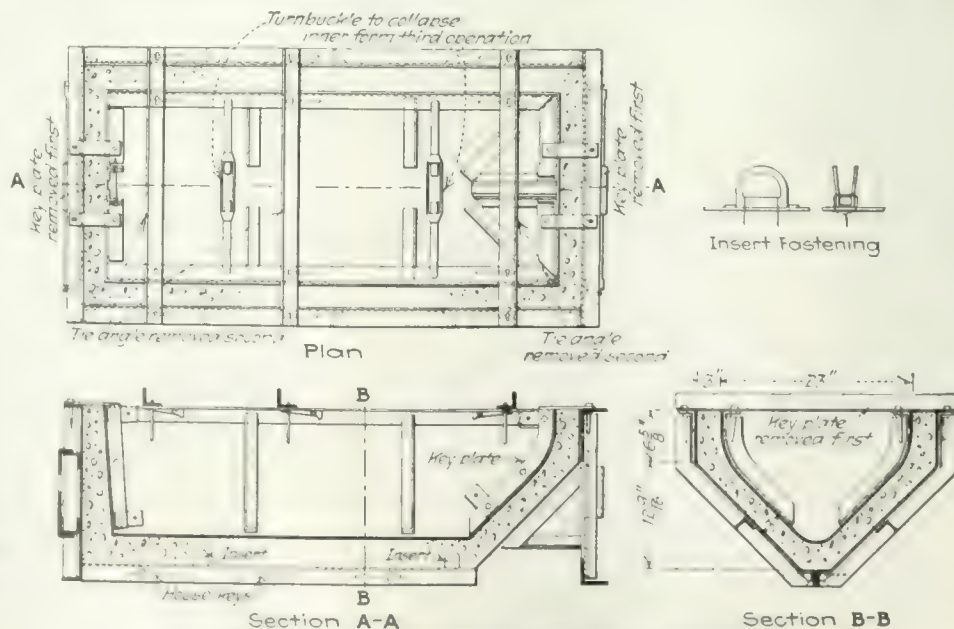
STEEL FORMS FOR PRECAST CONCRETE
